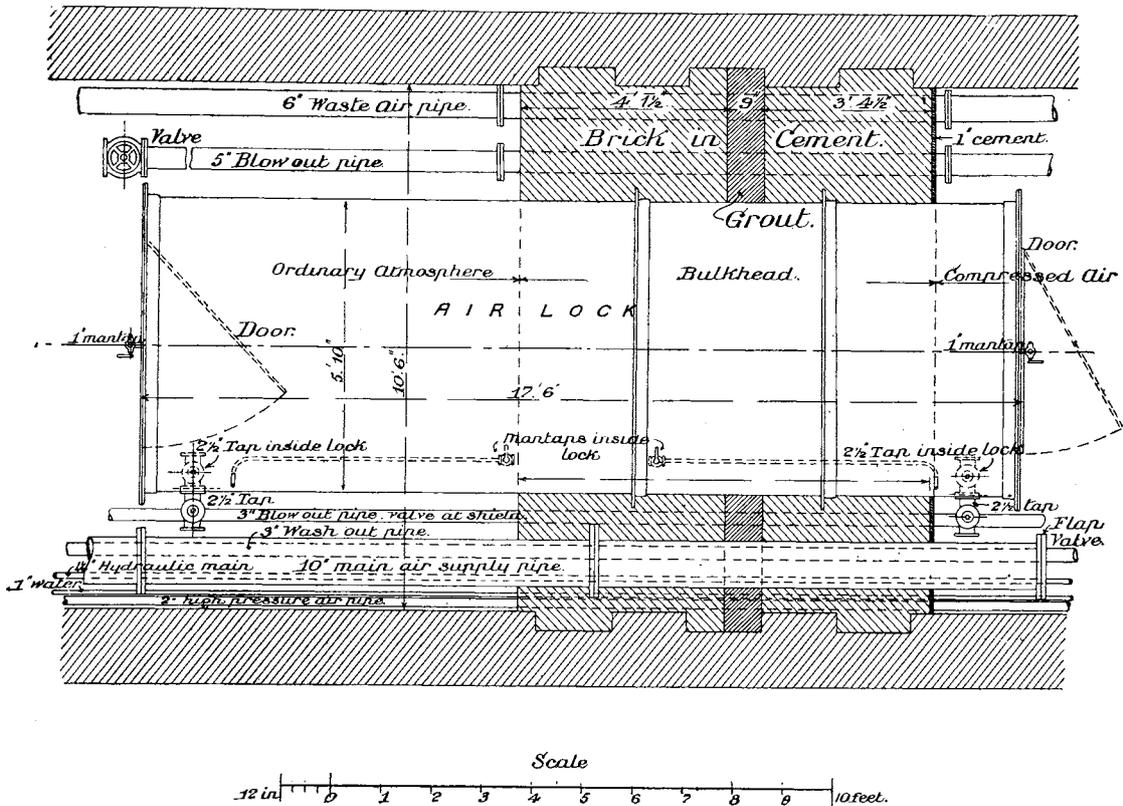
TYPICAL AIRLOCK FOR TUNNEL WORK.
